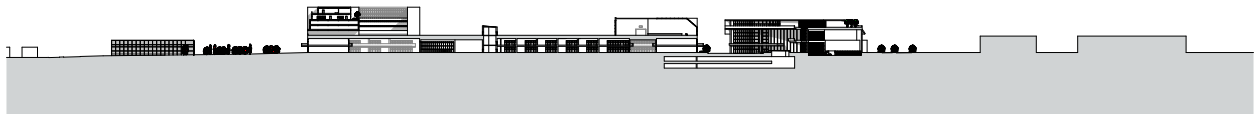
Transverse Site Section showing the underground parking (center) and the greenhouse conservatory (left).
